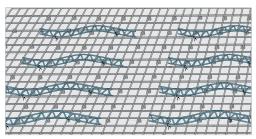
Step 3 - Assemble REHAU BKT modules
